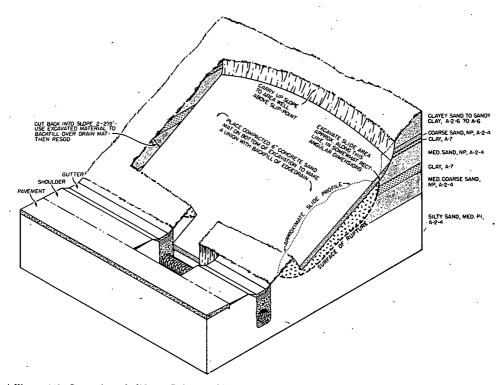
Correction of slide on Delaware Memorial Bridge approach, U. S. Highway 40, Del. The correction consisted of removing the slide mass, placing a sand layer connected to an underdrain system, backfilling, and resodding. In other words, the slope treatment involved improvement of both surface and subsurface drainage to improve the stability. (Sketched from design drawing furnished by Delaware State Highway Department)
